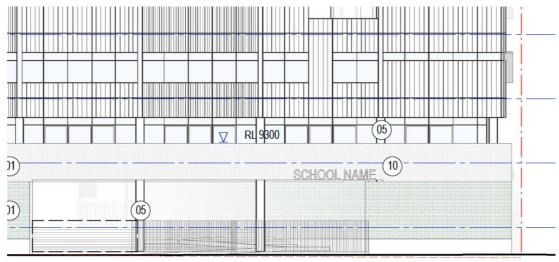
South elevation extract showing signage Source: Woods Bagot
